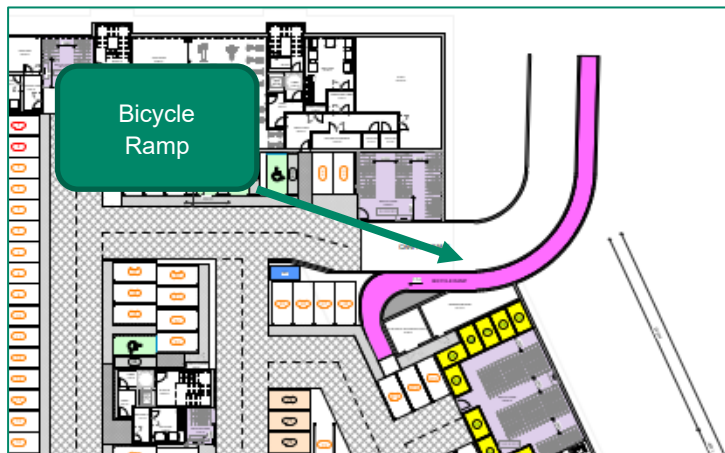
Bicycle Ramp Basement Layout (Source: C+W O'Brien Architects Drawing No. 092035)
